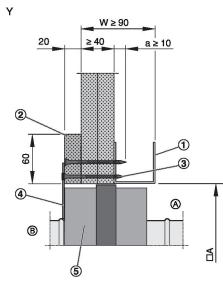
Dry mortarless installation in shaft wall with metal support structure
